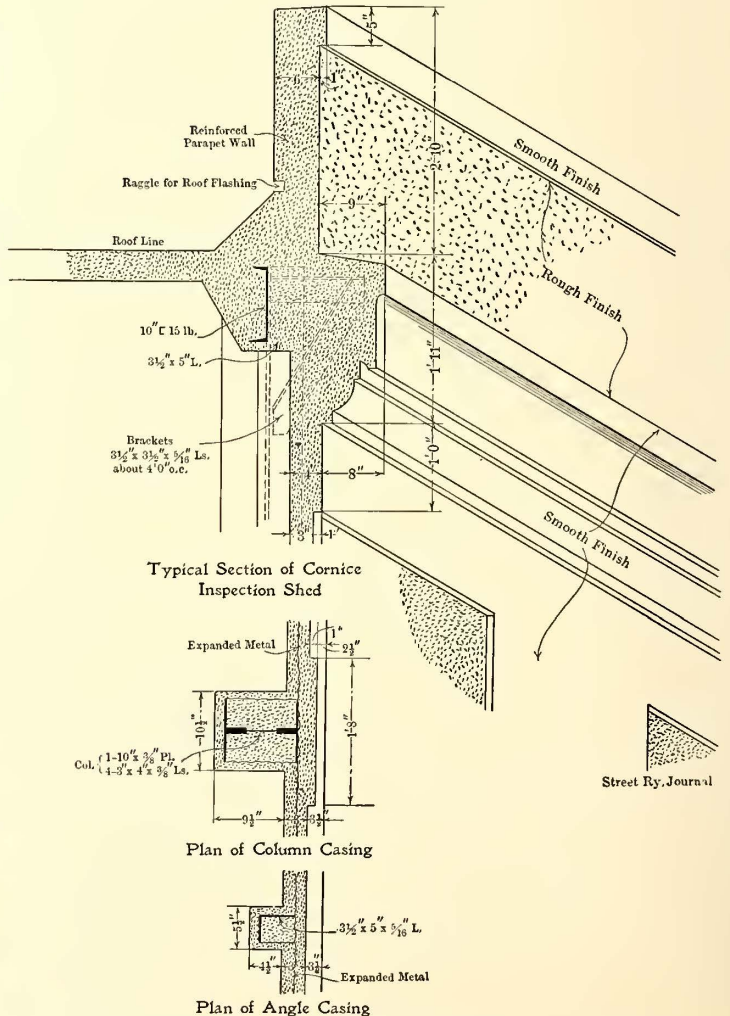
SECTIONS THROUGH CORNICES AND COLUMNS, SHOWING STYLE OF CONCRETE WORK
